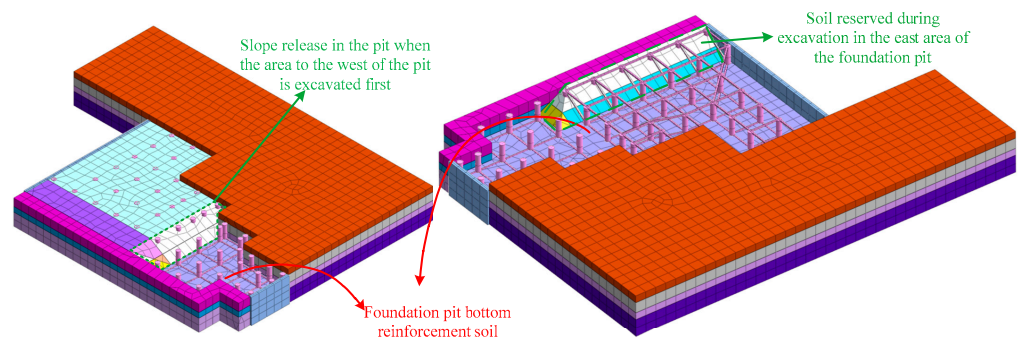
Location map of excavation slope on the west side of foundation pit and reserved soil on the east side.
